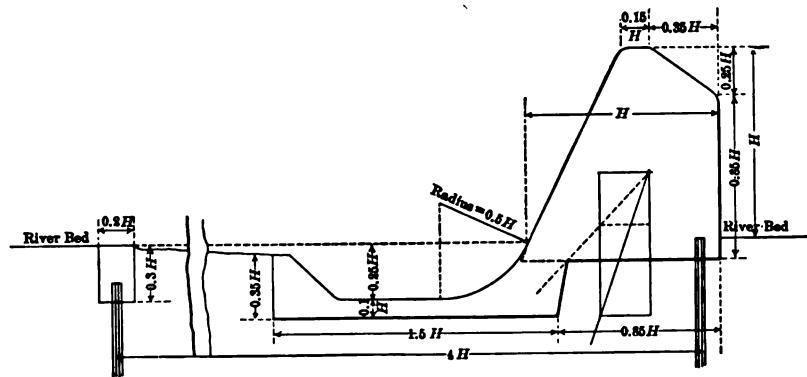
KOENIG'S TYPE OF OVERFLOW WEIR IN SAND FOUNDATION.
